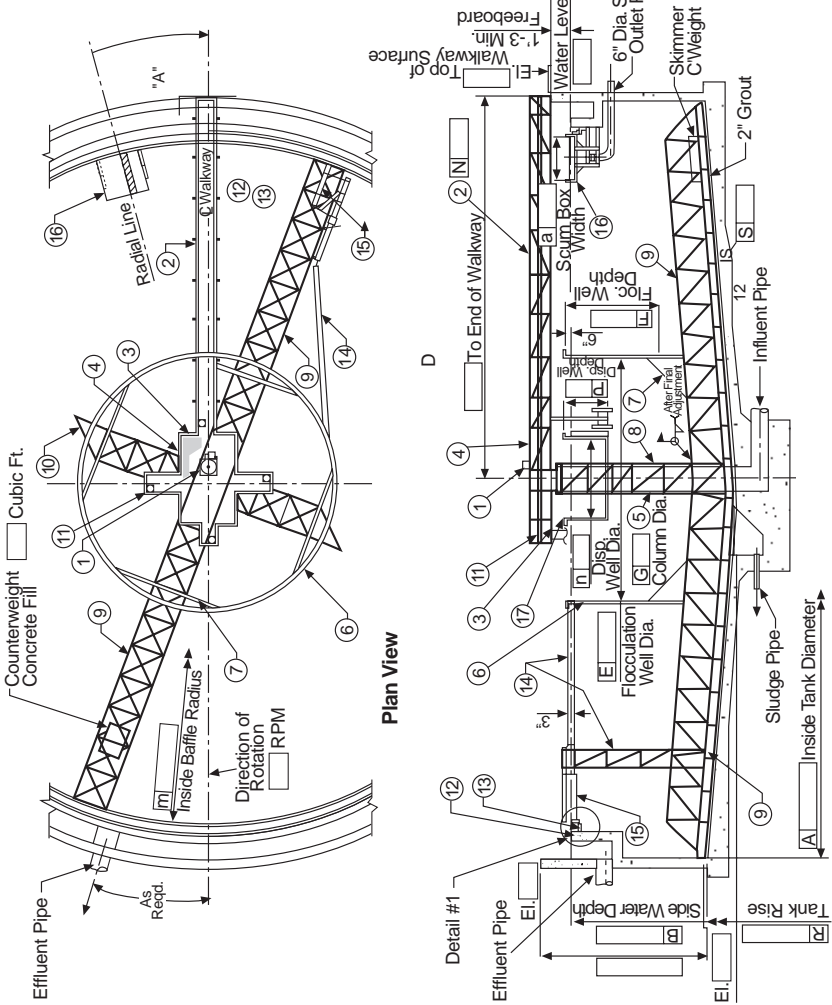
Circular clarifier with sloped bottom to central sludge hopper (Courtesy of WesTech Engineering)
